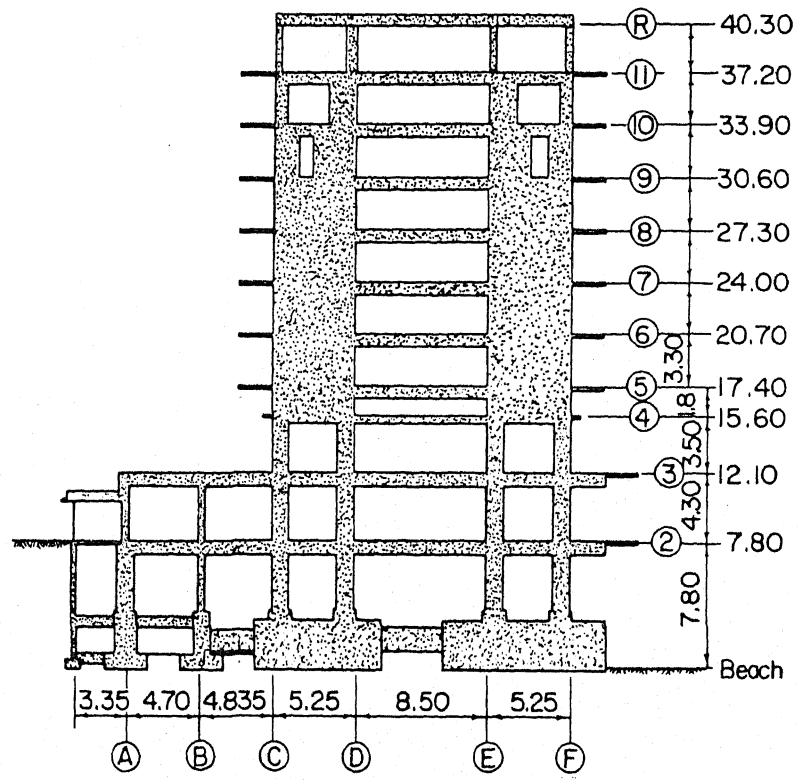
CROSS SECTION OF THE MAIN BUILDING, SHERATON-MACUTO
